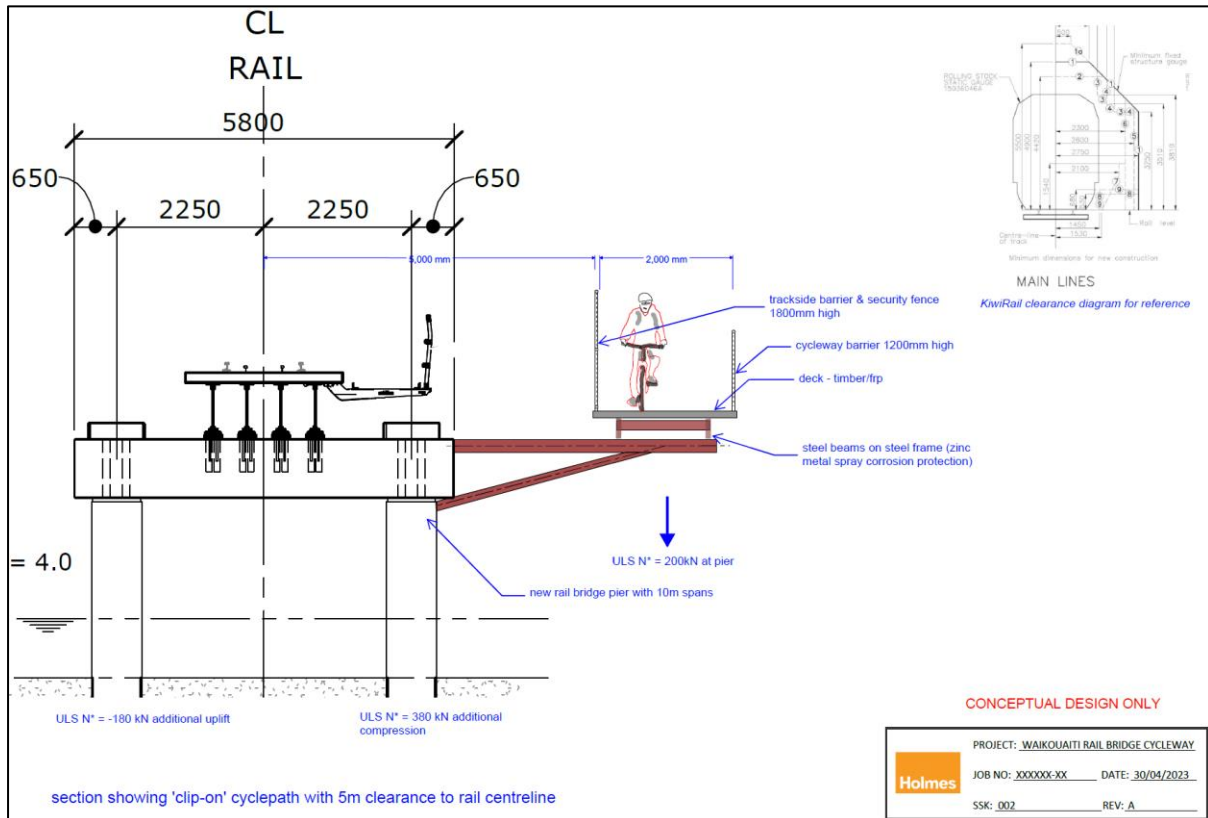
Concept design for clip on bridge [Holmes Consulting]
